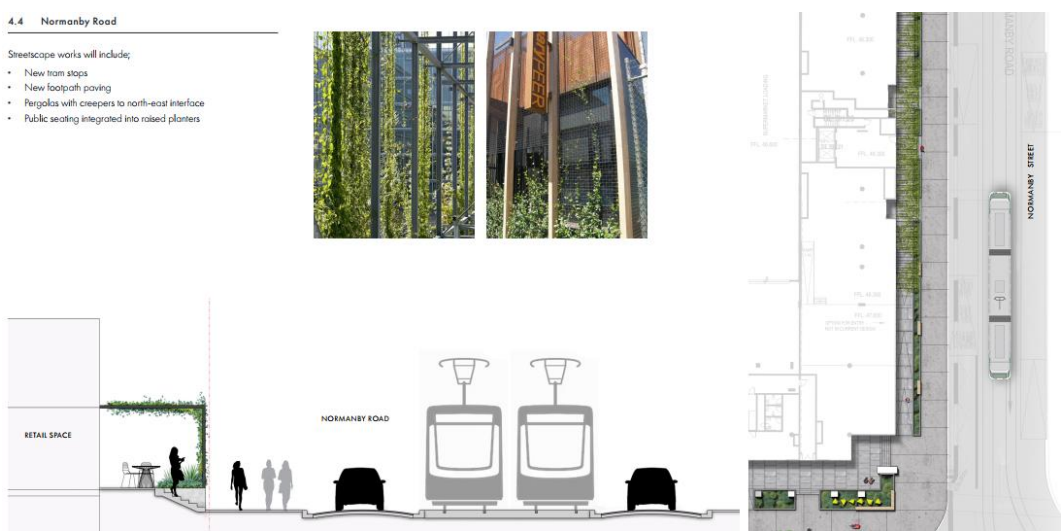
Extract of Landscape plan (Appendix K) - Normanby Road
